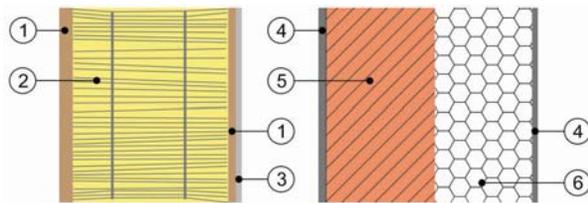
Wall compositions; left straw bale wall (right), right brick wall (left).
